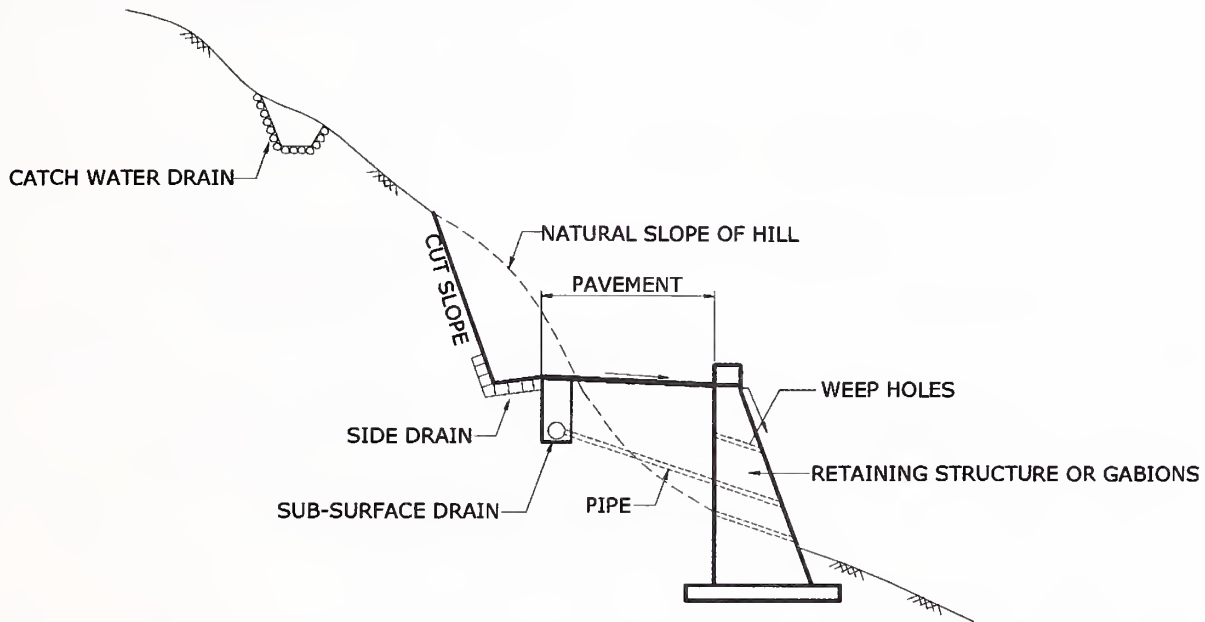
Cut and Fill Sections in a Hilly Terrain Showing Catch Drain, Side Drain and Retaining Wall
